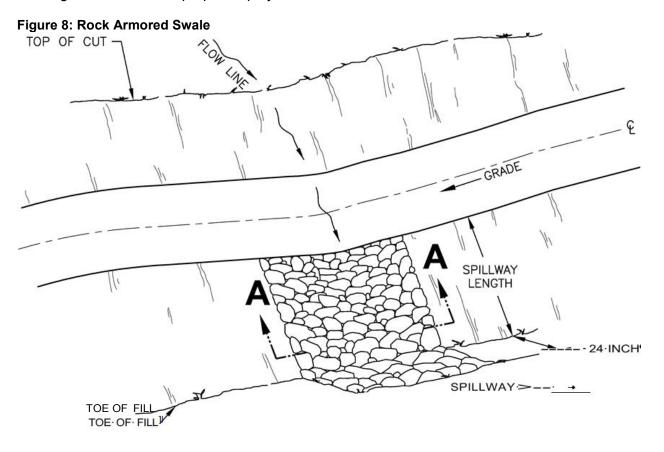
Rock Spillway for Drainage Dip or Cross Drain
